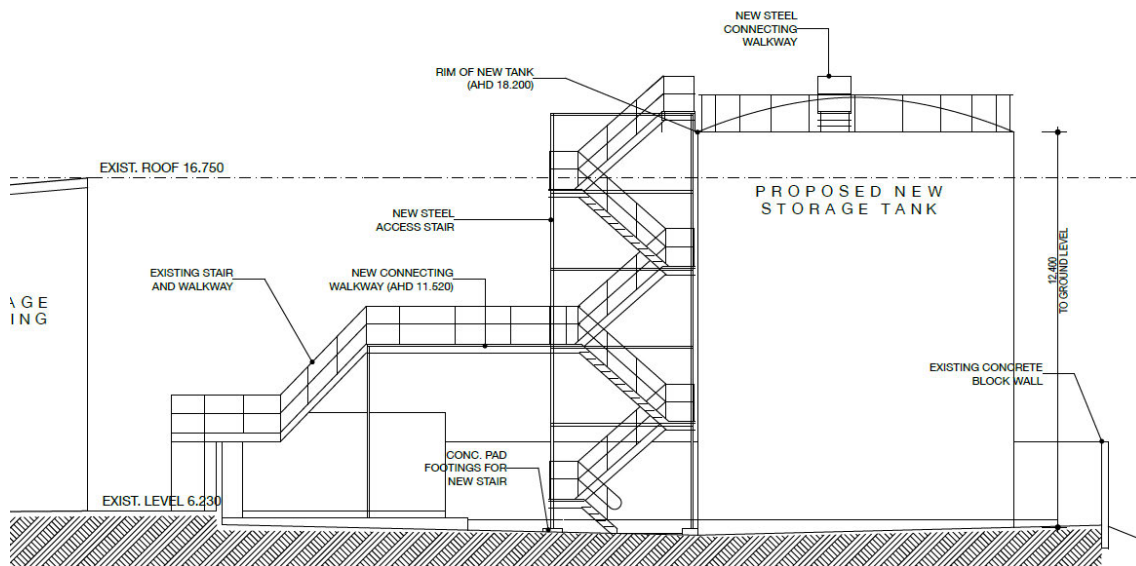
East elevation of proposed storage tank showing new connecting walkway and access stair (Source: James Gatley Architects)
